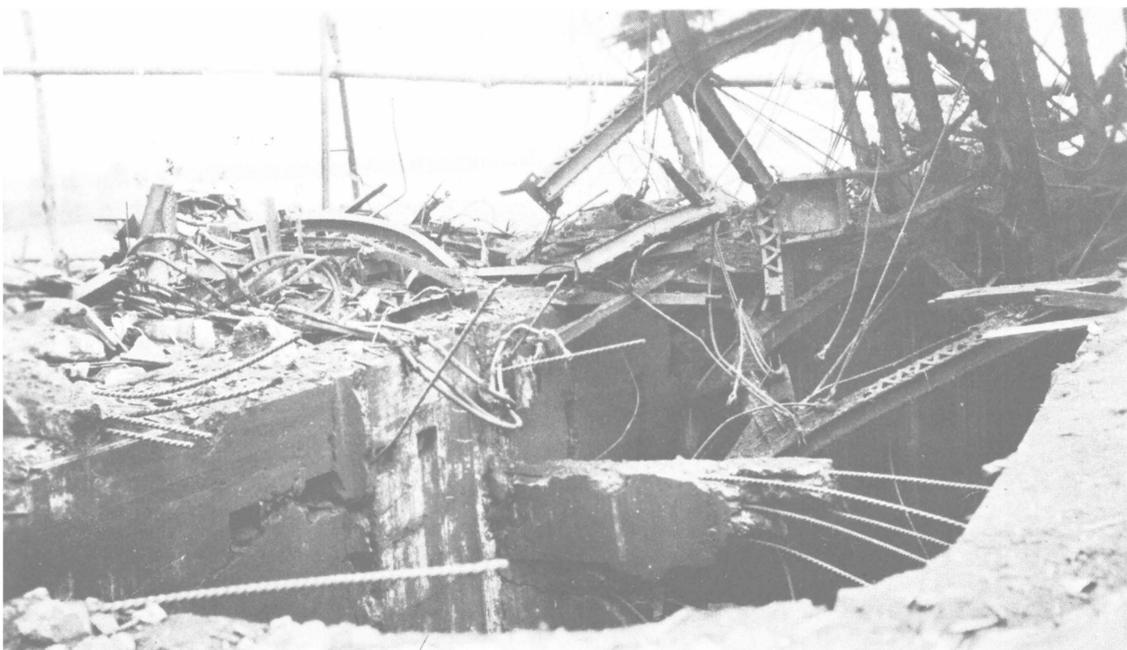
Wreckage at surface of Woodward No. 3 shaft, Edwardsville, Pa., after explosion, May 26, 1927.
